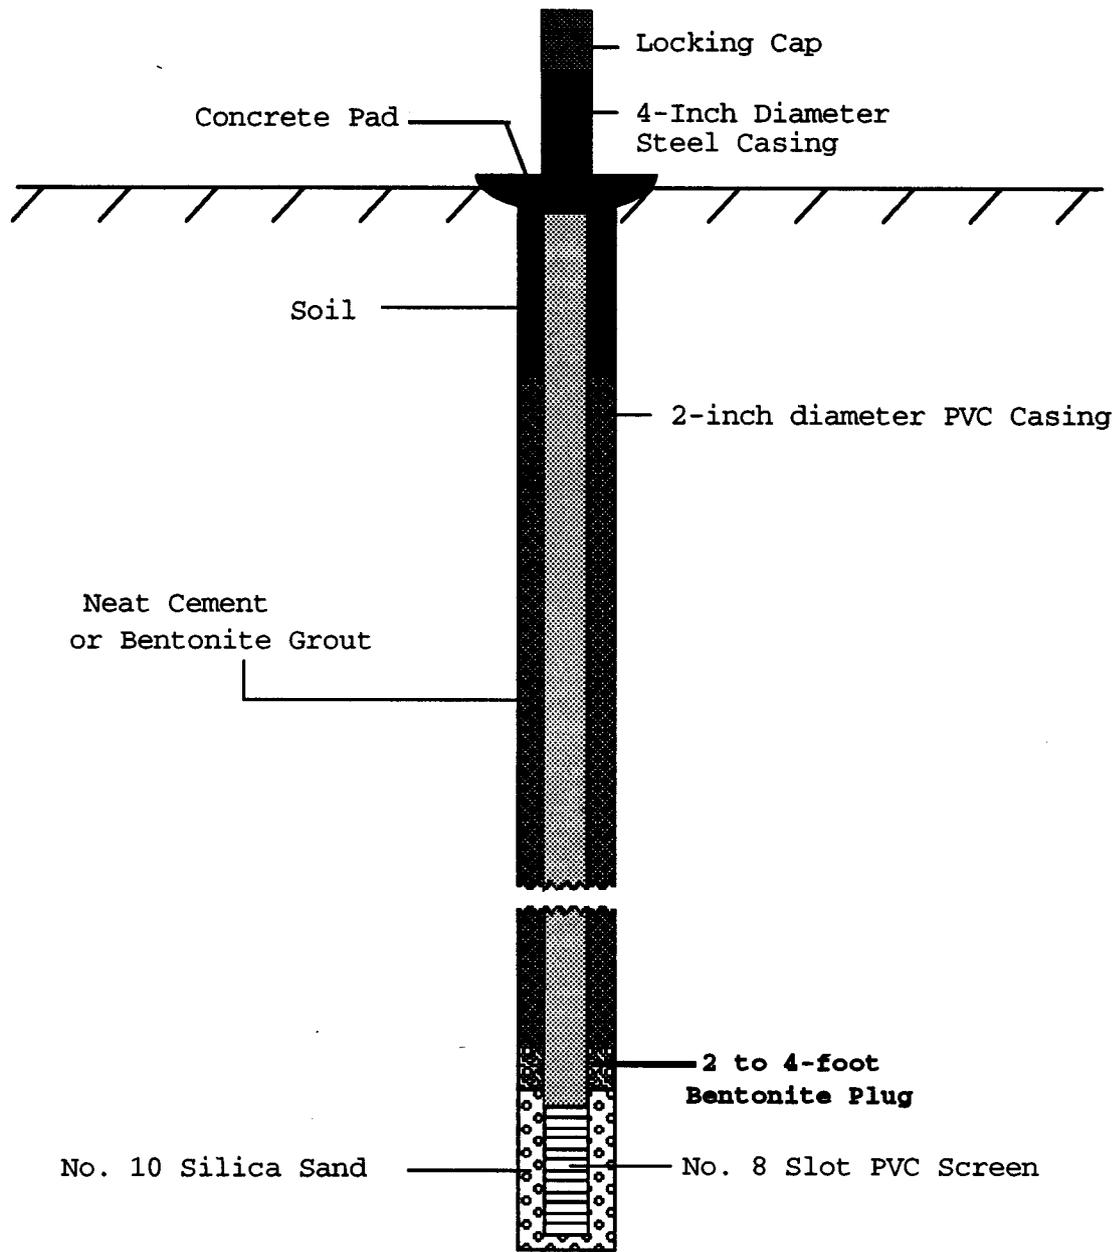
Construction design used for monitoring wells installed at the Selfridge landfill.
